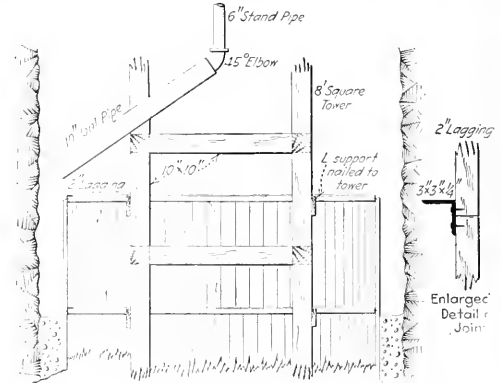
DETAIL OF CONCRETING AROUND FORMS
